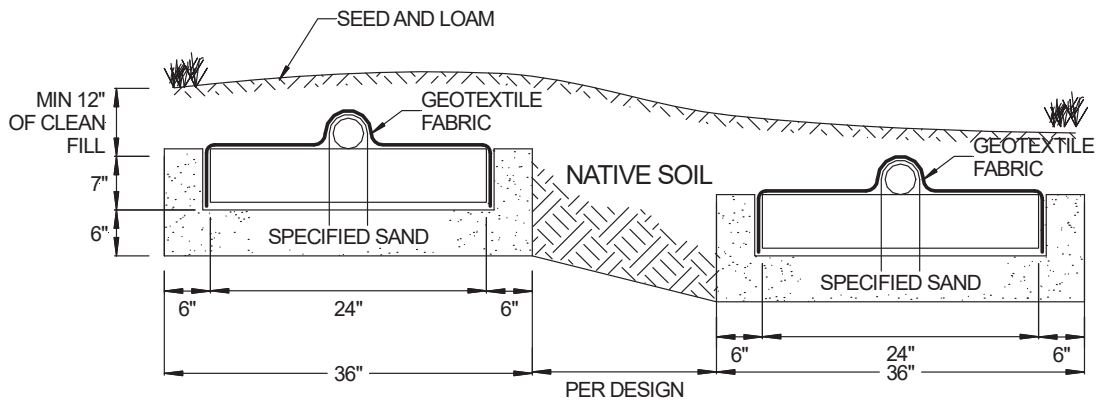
SECTION VIEW – TRENCH SYSTEM – SLOPING SITE
